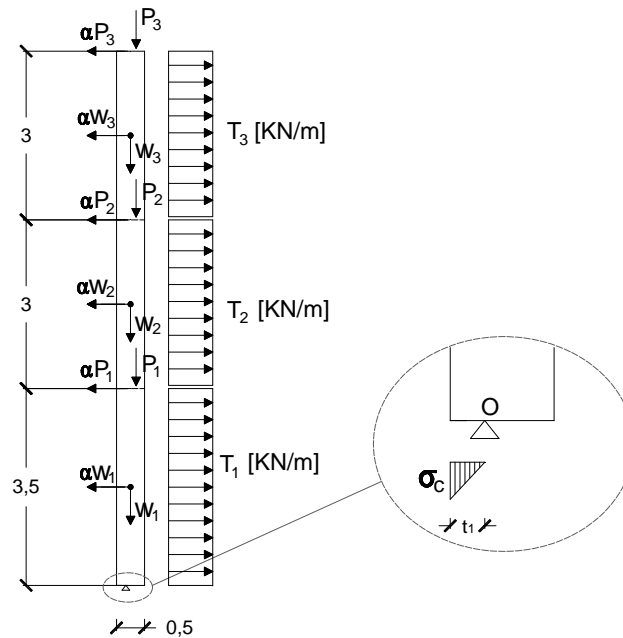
Kinematic mechanism concerning the out-of-plane overturn of the façade wall with the consideration of the wall-to-wall strengthening system.
